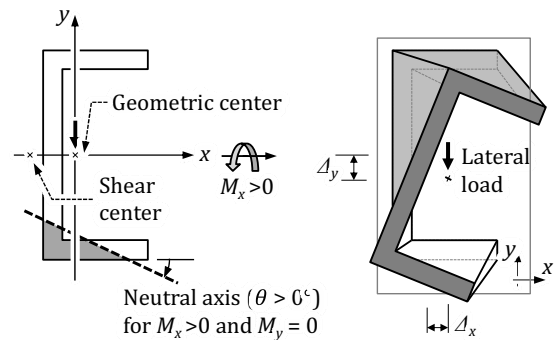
Twisting of mono-symmetric C-shaped cantilever wall
